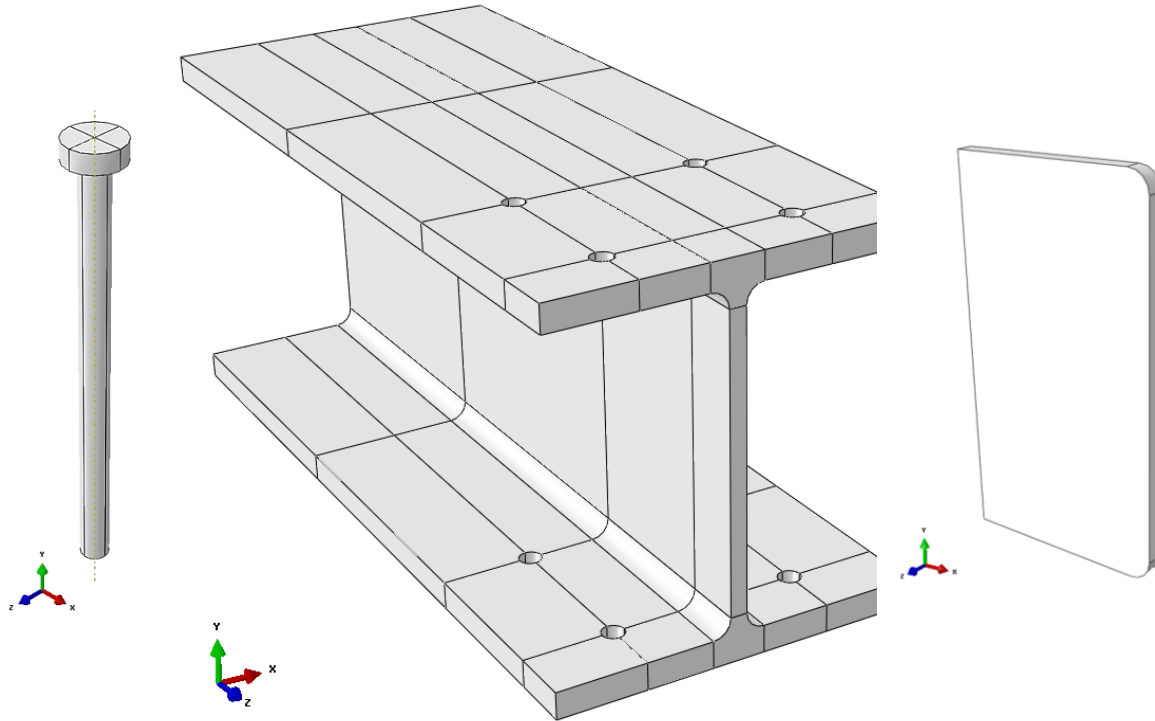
Top beam model, including bolts, stiffeners, and the beam.
